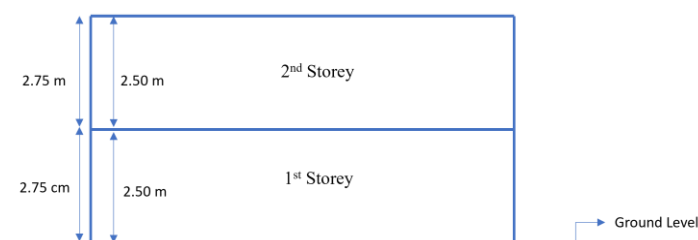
Elevation plan of two storey single-family with slab on grade house
